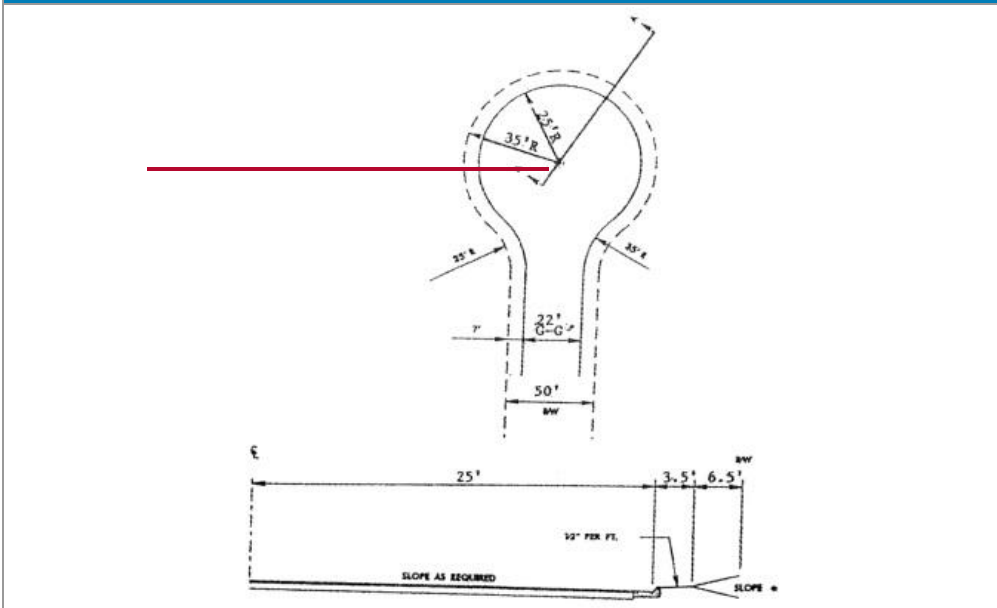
B: ILLUSTRATION OF CUL-DE-SAC WITH CURB AND GUTTER SECTION
